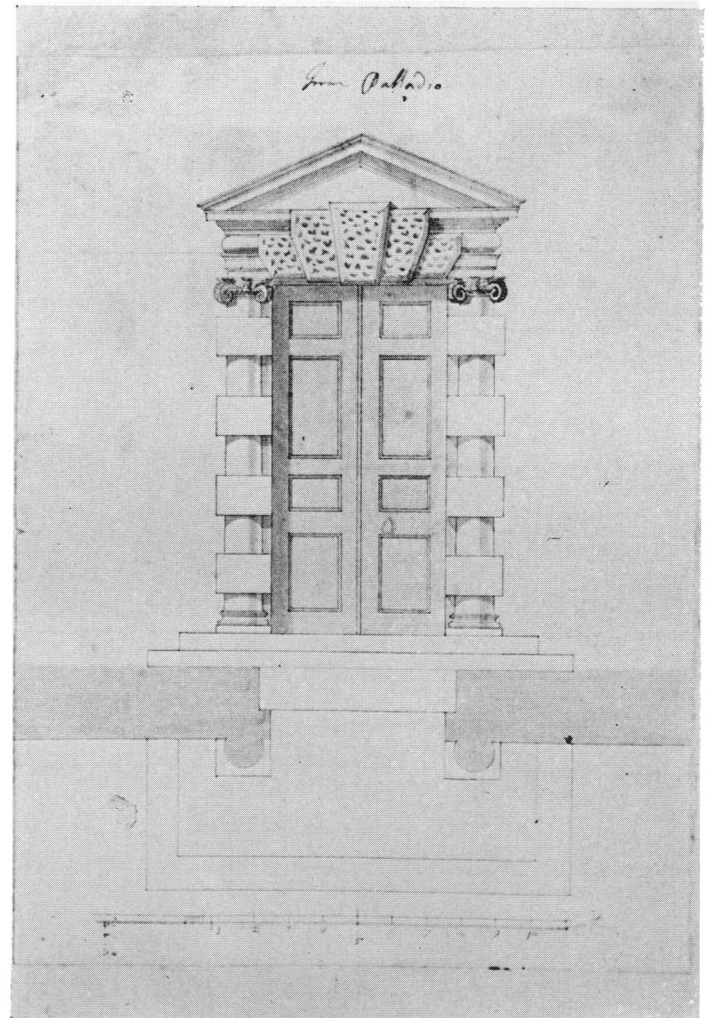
Plan and elevation of a rusticated Ionic doorway [2]
